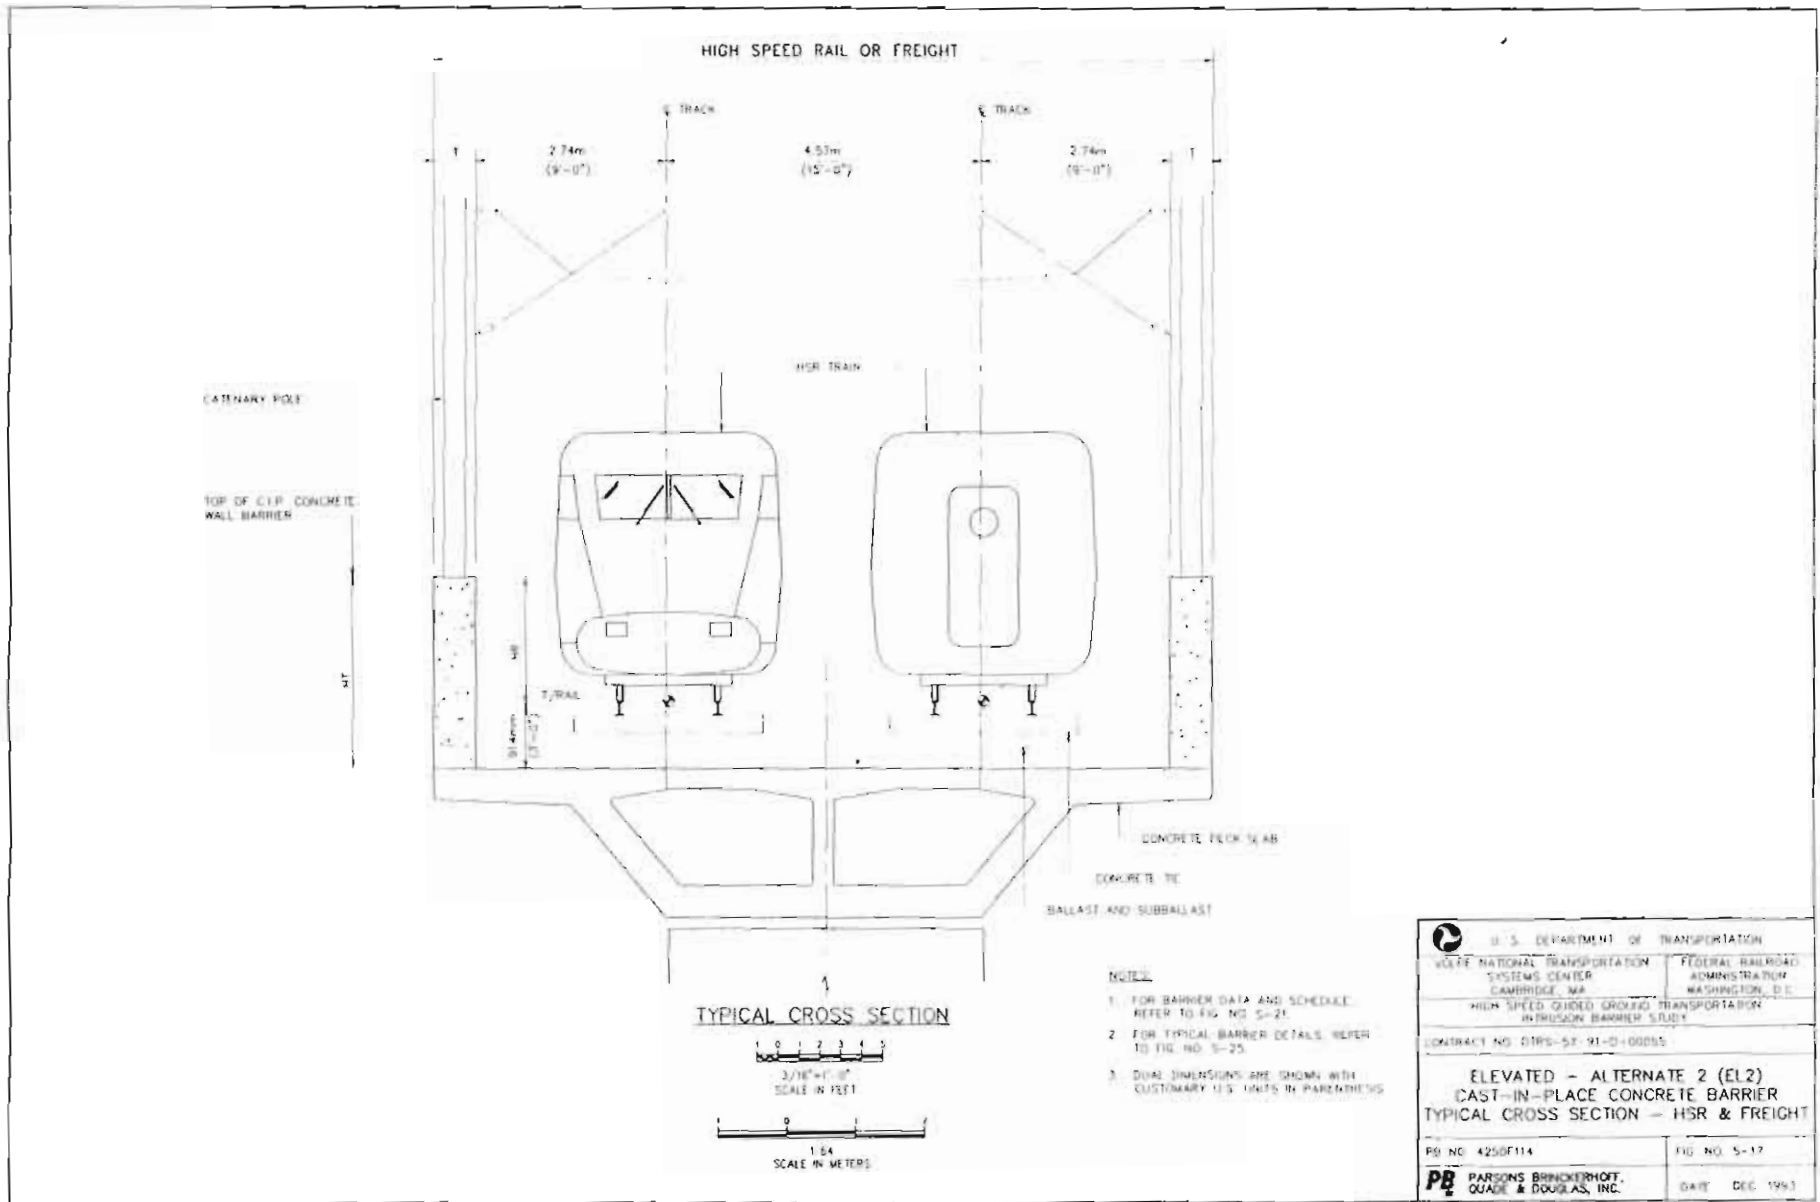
ELEVATED ALTERNATE 2: C.I.P. CONCRETE WALL - TRANSVERSE SECTION/RR
